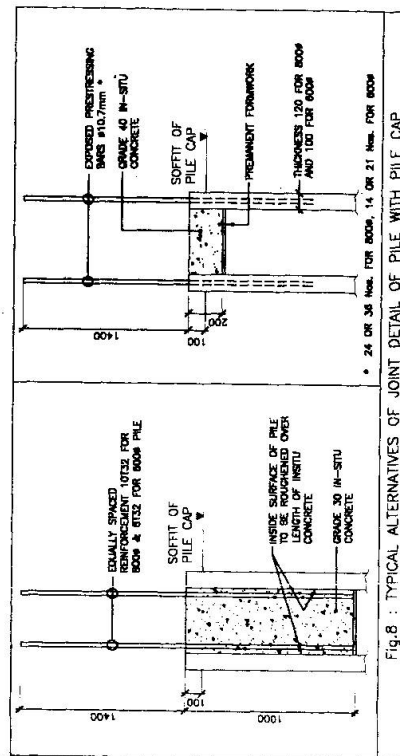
TYPICAL ALTERNATIVES OF JOINT DETAIL OF PILE WITH PILE CAP
